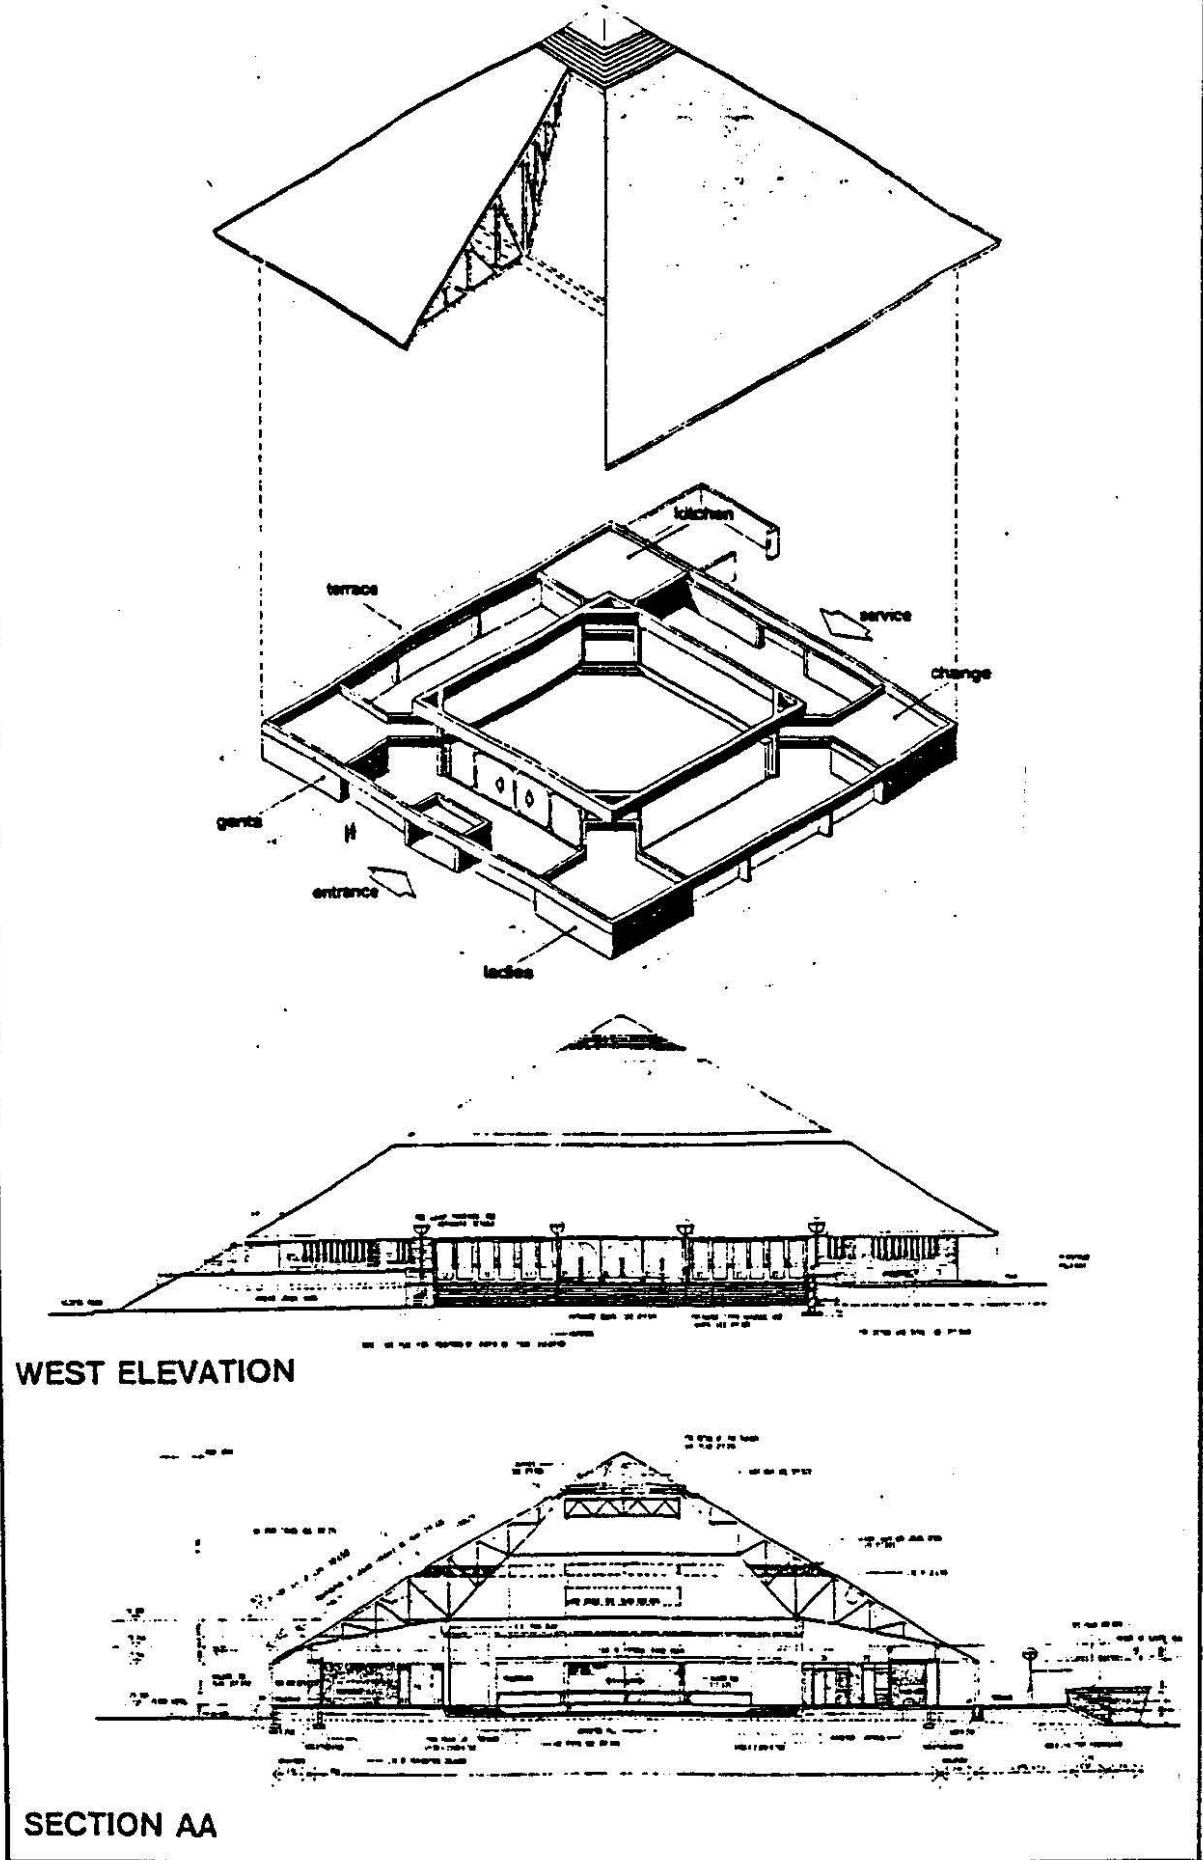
ELEVATIONS OF WESTRIDGE HALL
